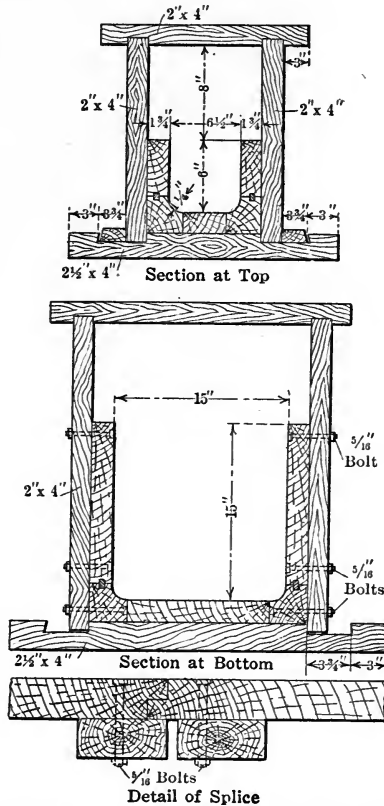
Forms—Marseilles Land and Water Co.'s concrete pole.
